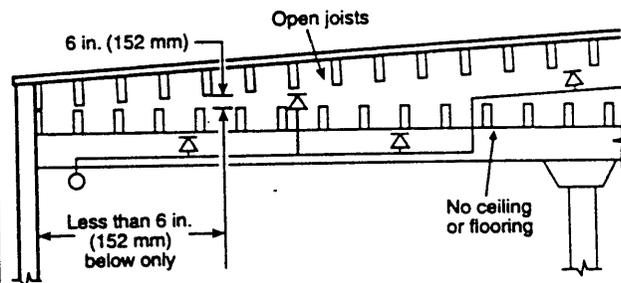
Arrangement of sprinklers under two sets of open joists — no sheathing on lower joists.
